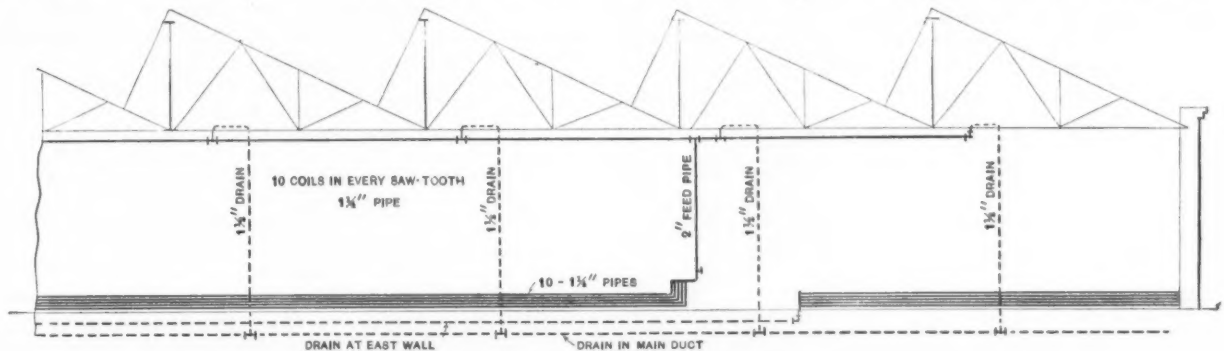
Longitudinal Section of Saw Tooth Building with Arrangement of Heating System.
